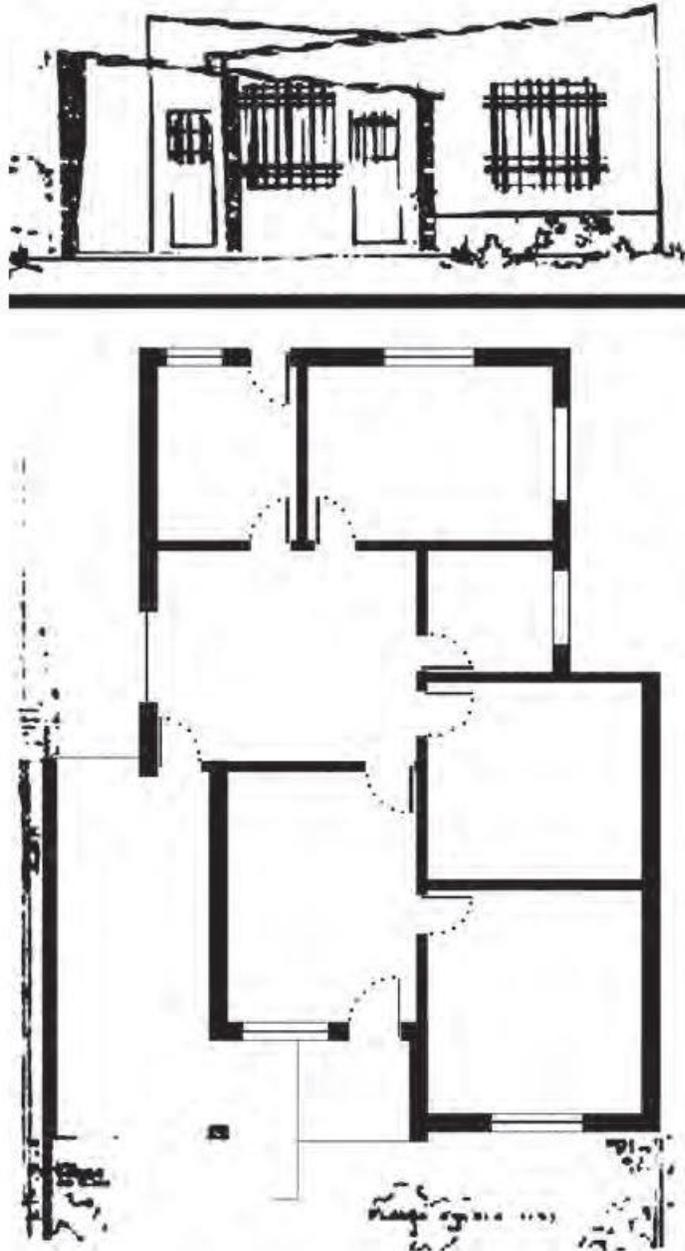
Typical facade and floor plan from Lara, 2008. Courtesy of Fernando Lara.
